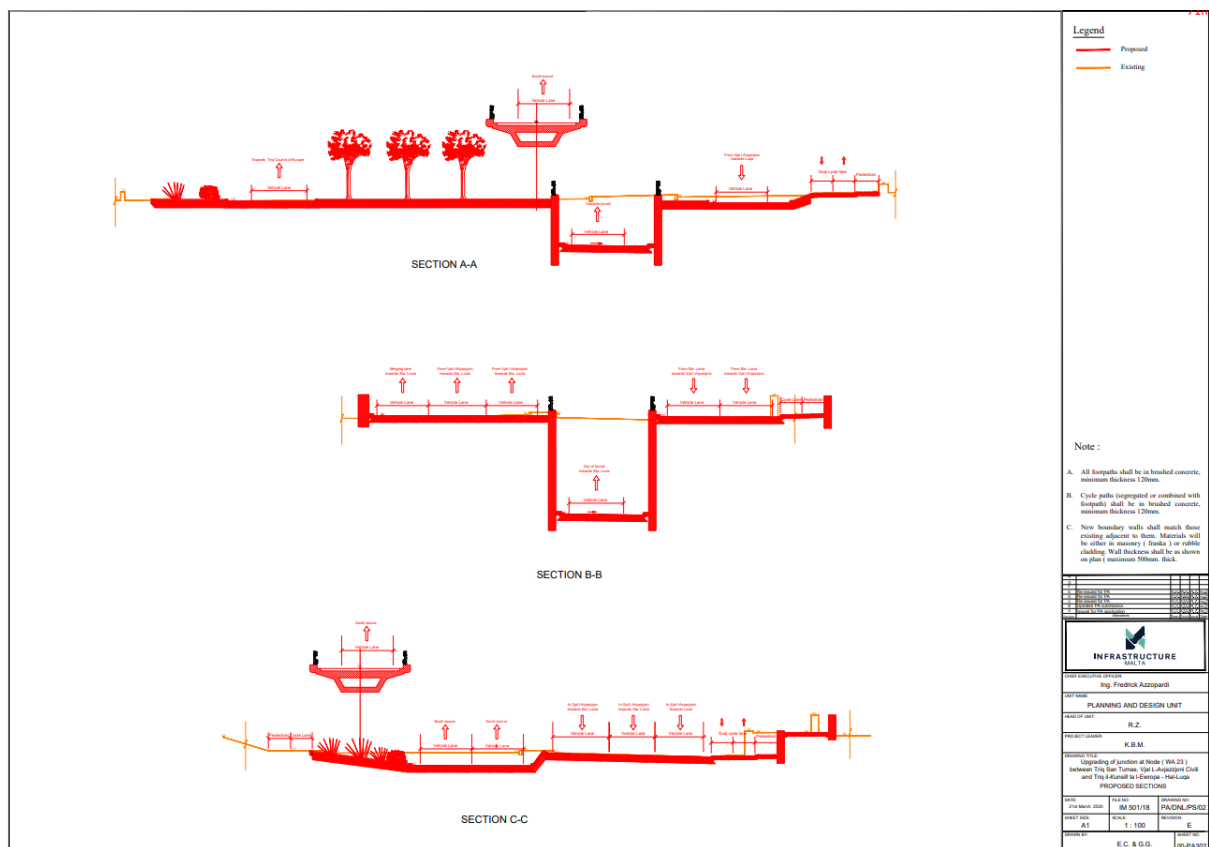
Proposed sections (PA/04721/20 – 71m on EApps)
